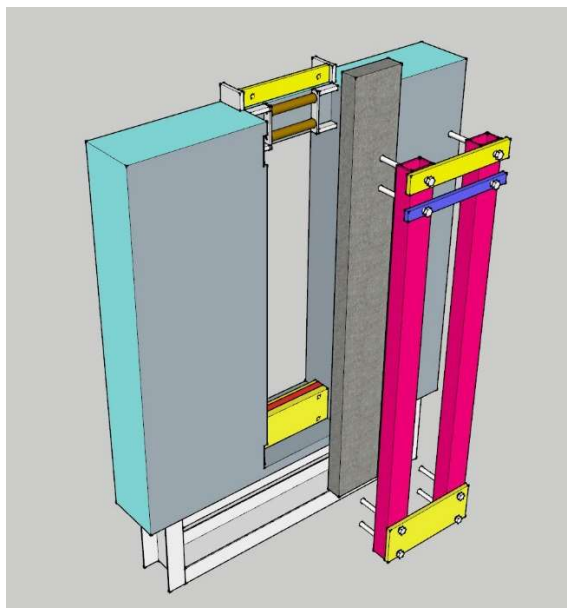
Mounting rig for the concrete wall elements (Berglund and Hansson, 2017). The two vertical steel beams (red) located beside the wall element were only used during the air blast loading setup. The axial loading frame with its hydraulic jack is not shown.
